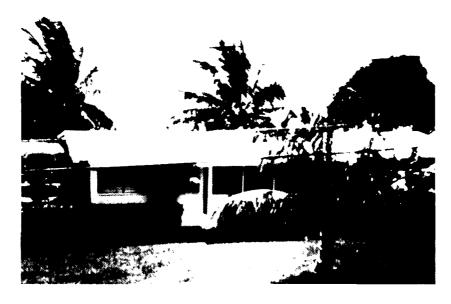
Typical experimental house with low slope concrete roof deck. Note tropical foliage, which is often dense, and roof mounted TV antenna. Naval Station, Roosevelt Roads, P.R.
